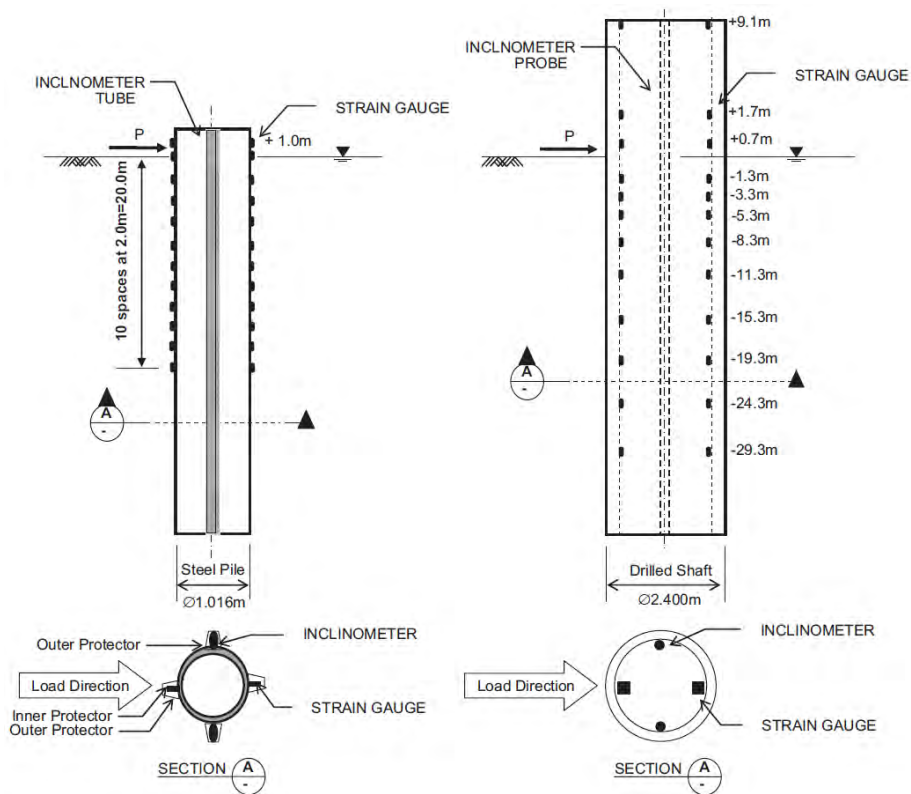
Vertical and horizontal sections of the steel driven piles (left) and the drilled concrete shaft (right) subjected to lateral load tests at the Incheon bridge site.
